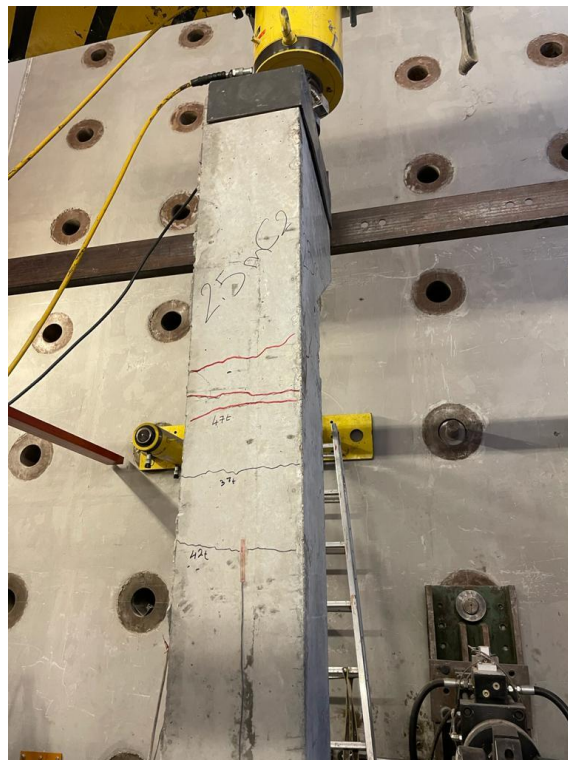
Cracks at the tension side of Column 2.5-C00-2
